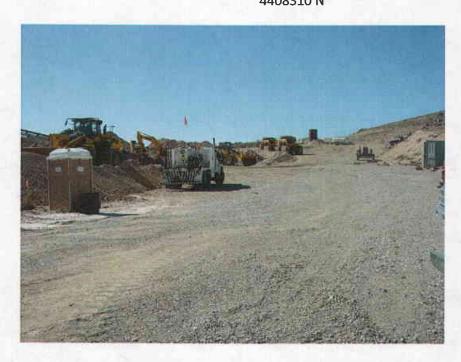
This power shovel was one of several pieces of excavation equipment at the site.
